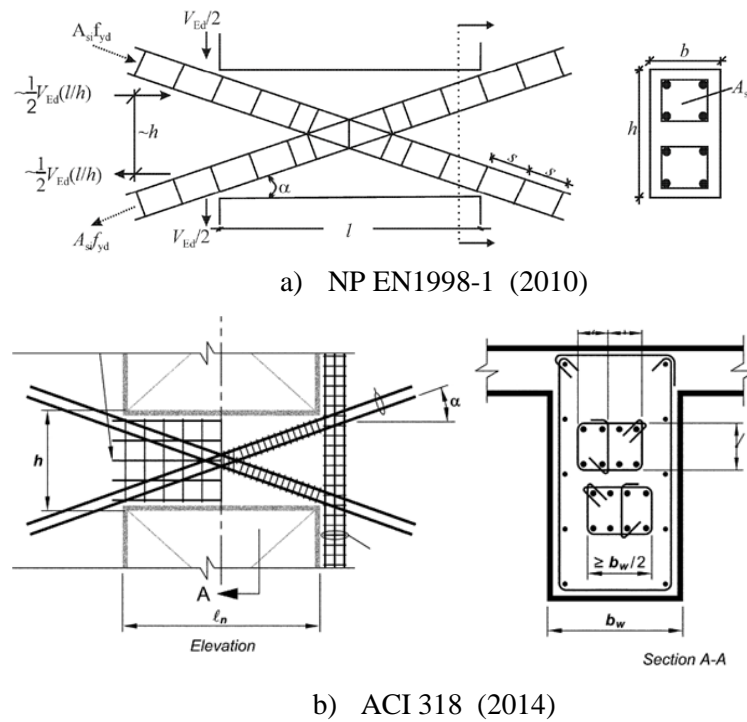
Bi-diagonal Reinforcement Layouts
